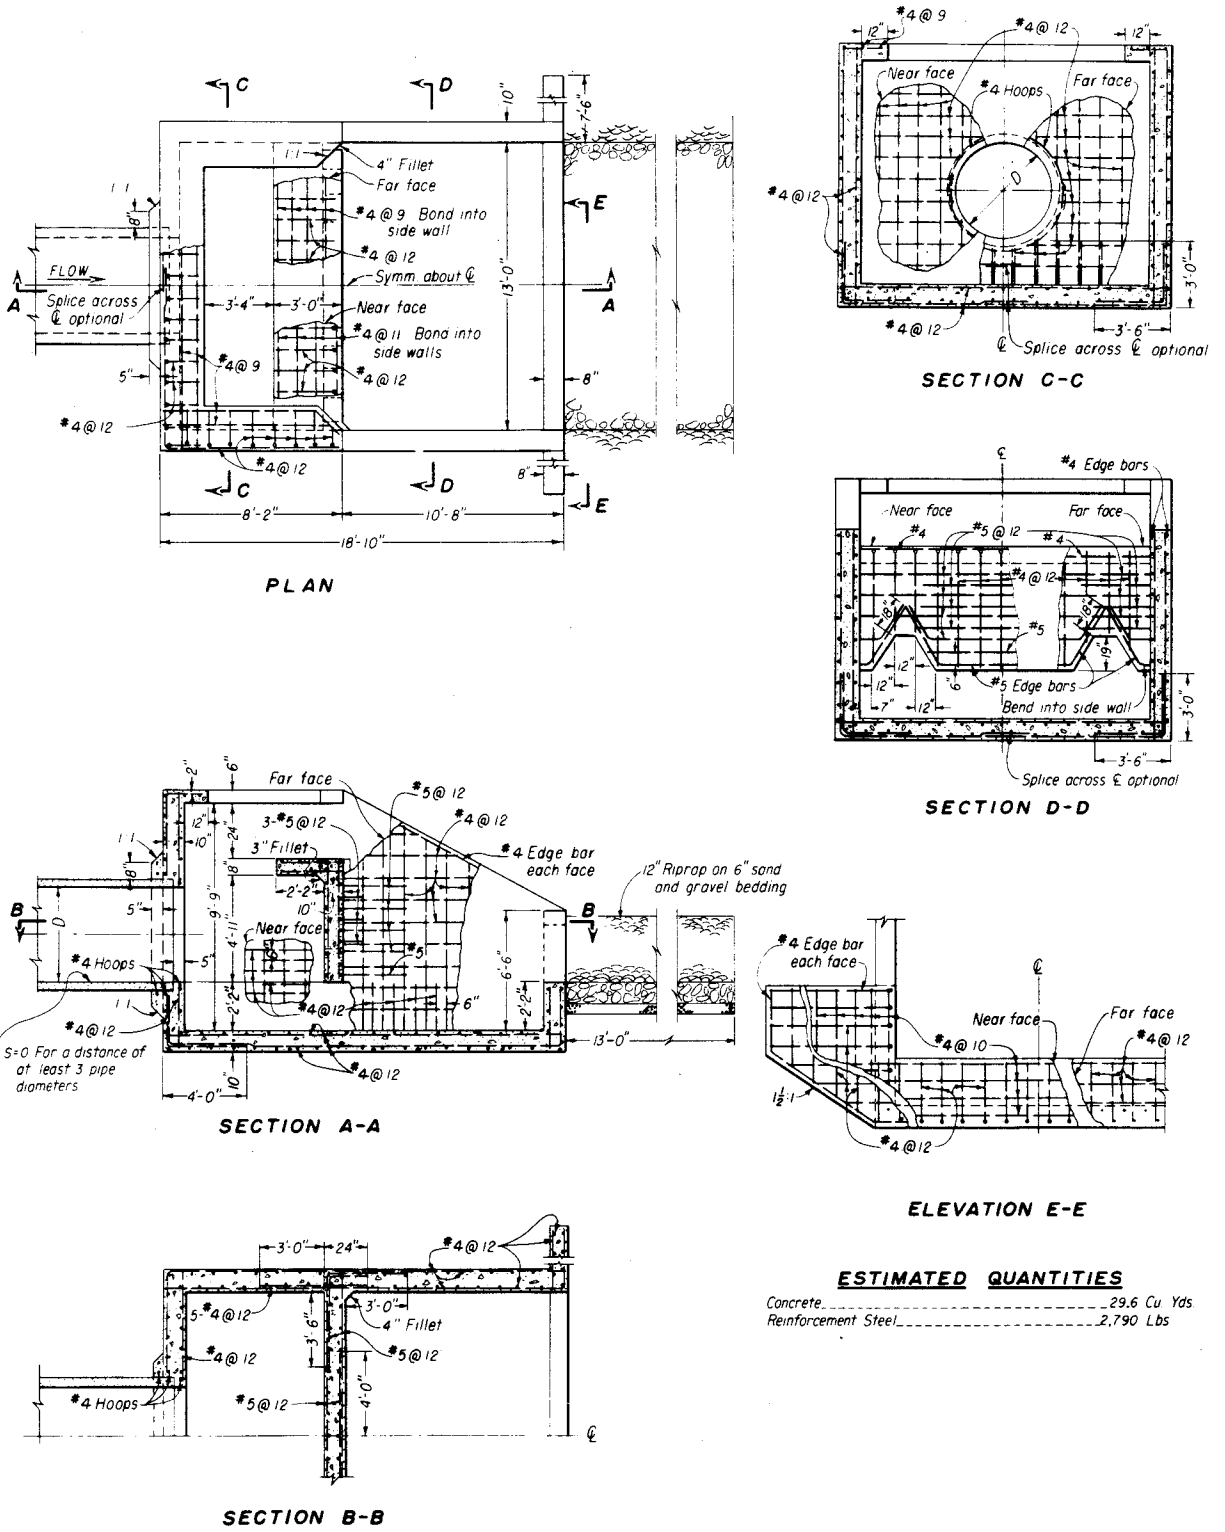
Type 9 baffled outlet. 103-D-1348
